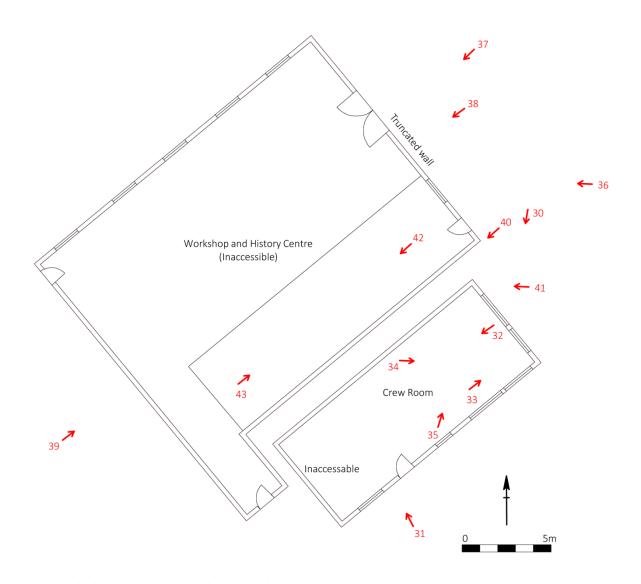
Crew Room, Workshop and History Centre photo plan (scale 1:200)
